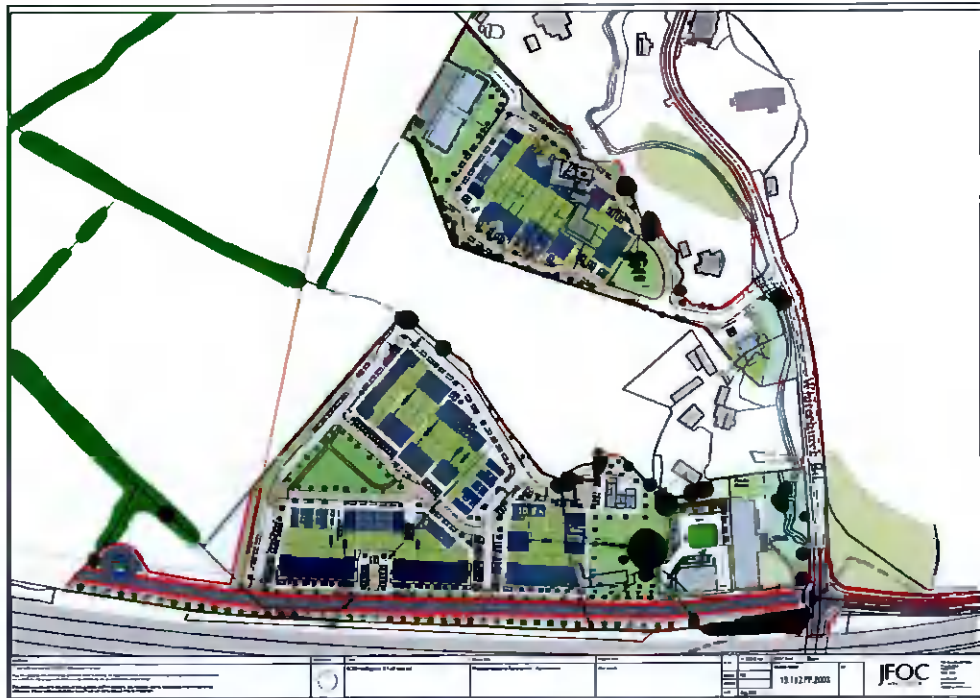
Proposed Site Layout on the Whitechurch Lands.
